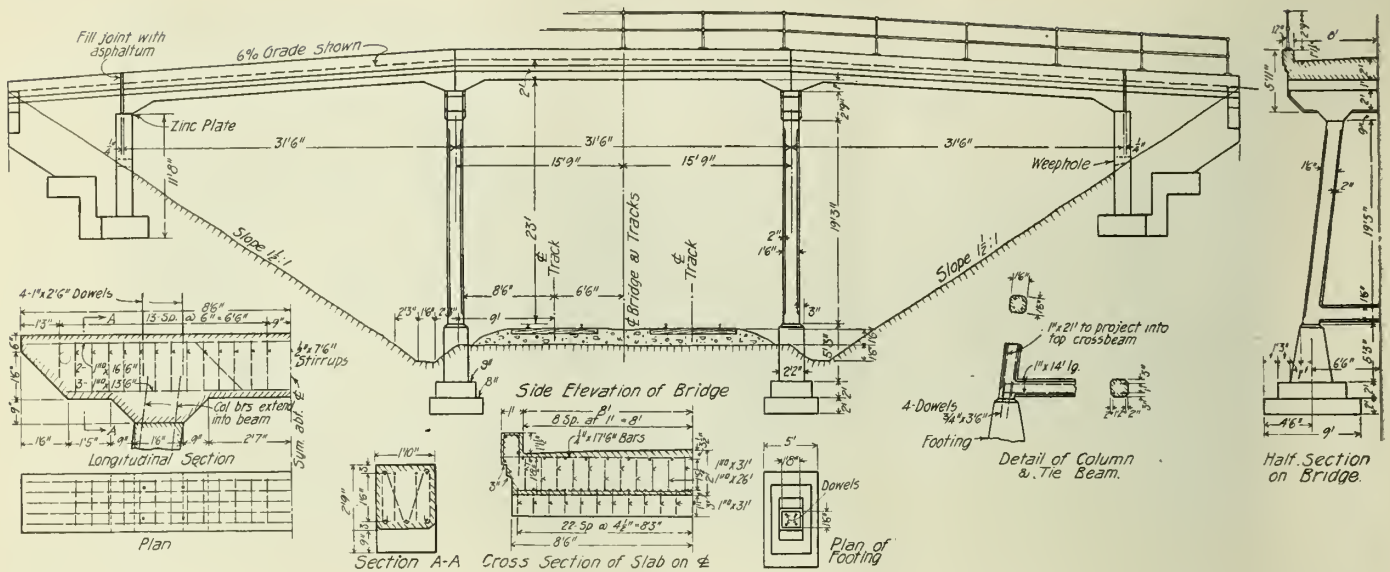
General Plan of Typical Reinforced Concrete Overhead Highway Bridge, 16 ft. Roadway, C., M & St. P. Ry.
